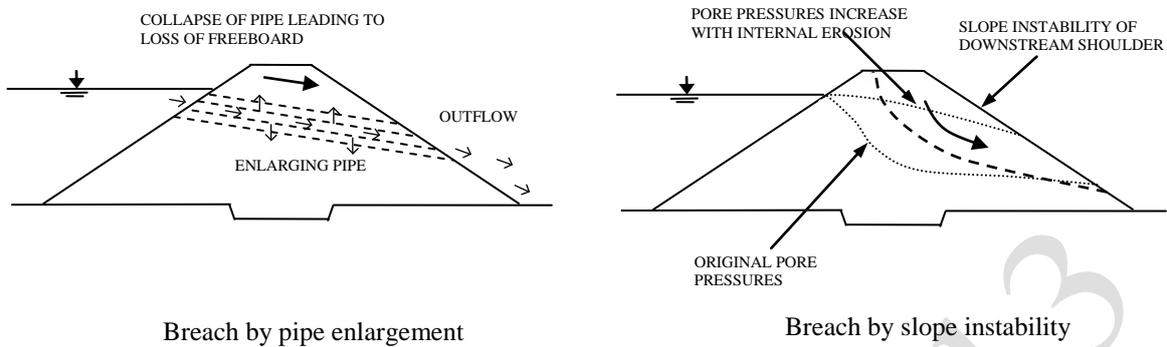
(a) Potential breach (failure) phenomena-pipe enlargement and slope instability
